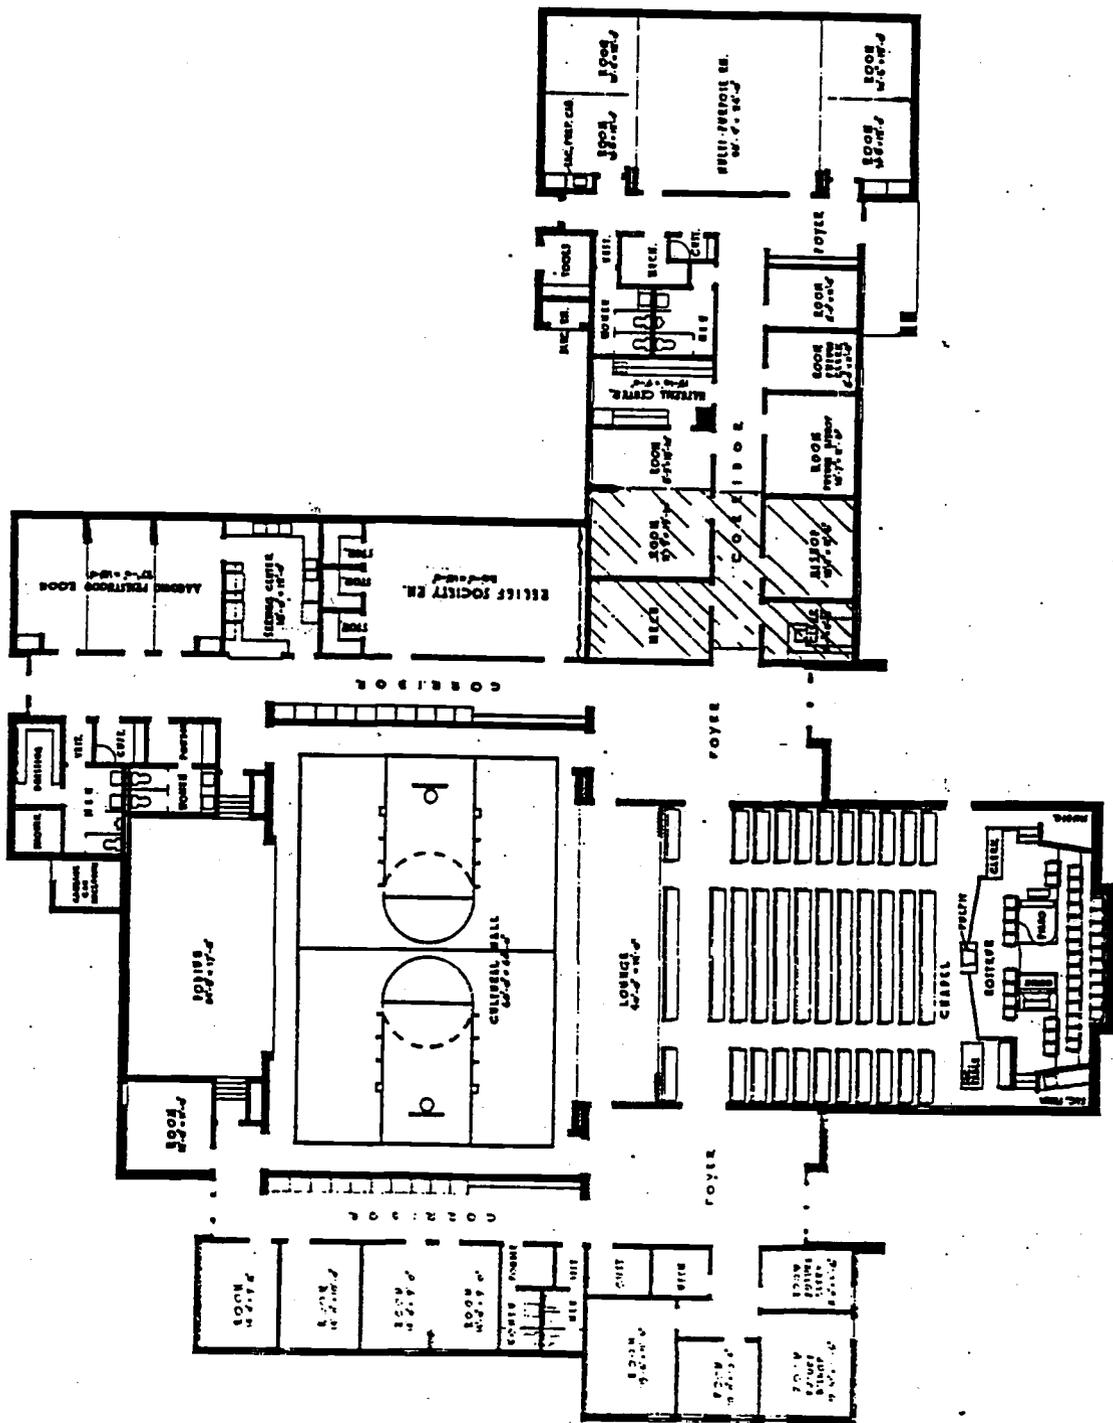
Floor plan of the Beaumont expandable meetinghouse. LDS Church Architectural Services Division.
